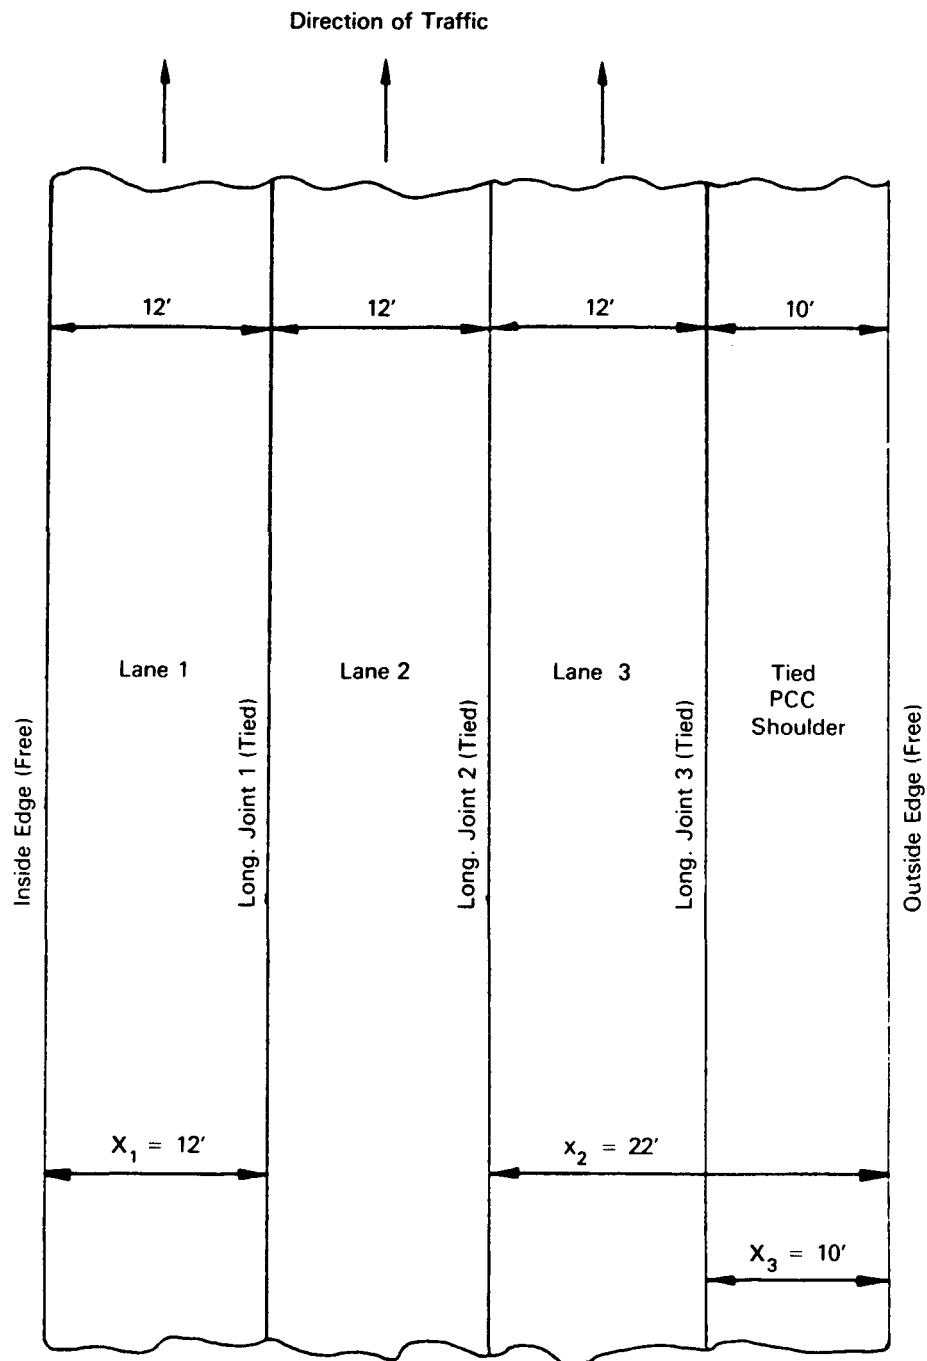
Plan View of Three-Lane Facility Showing Longitudinal Joint Positions and Corresponding Distances to Nearest Free Edge
